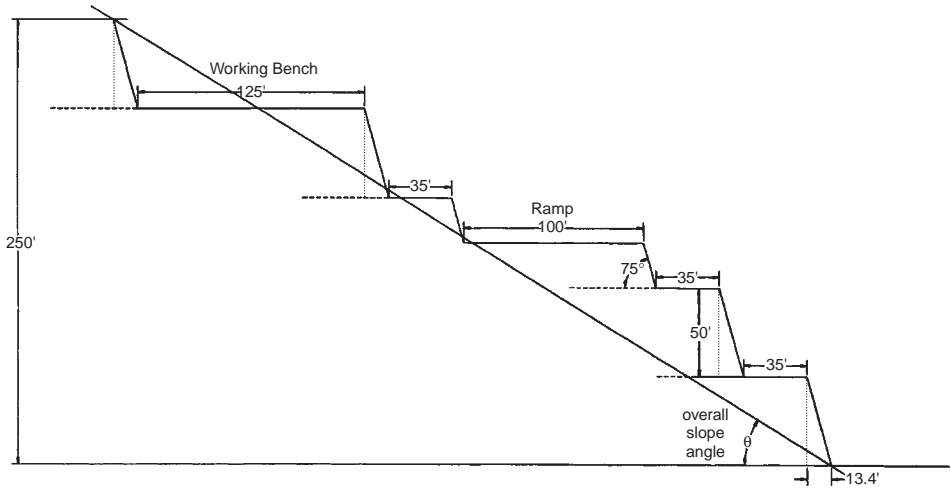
Overall slope angle with one working bench and a ramp section.
